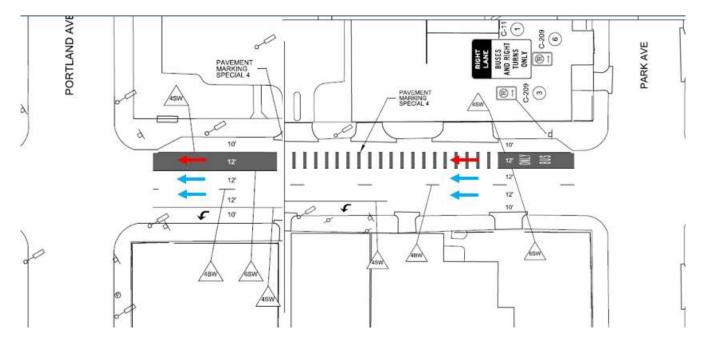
Diagram of Bus-Only Lane along 7th Street between Park Avenue & Portland Avenue
